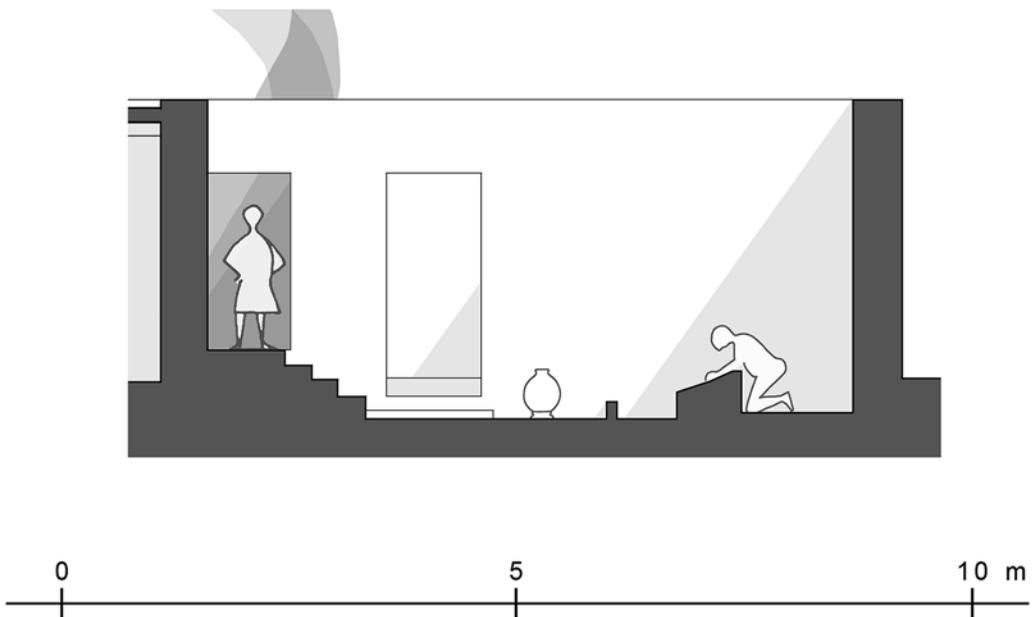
Reconstructed section of house H 70 (ca. 1850–1750 B.C.) with door to bread-baking room B (left) and quern emplacement (right)
